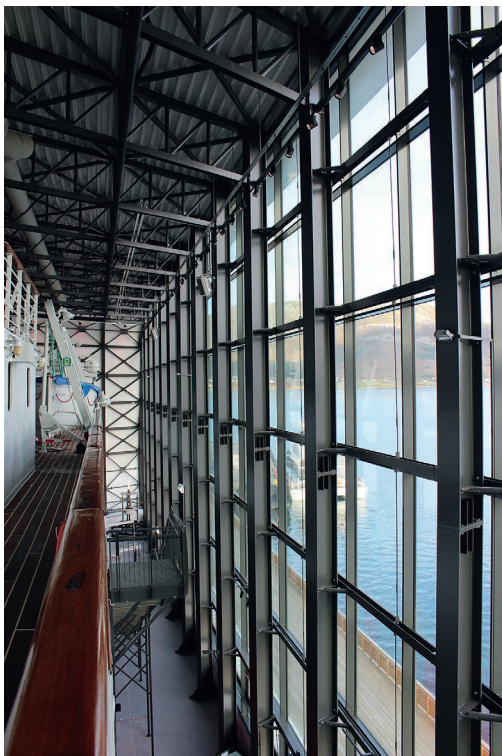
Equally stacked steel frames in the glass façade inside the Protective Building
